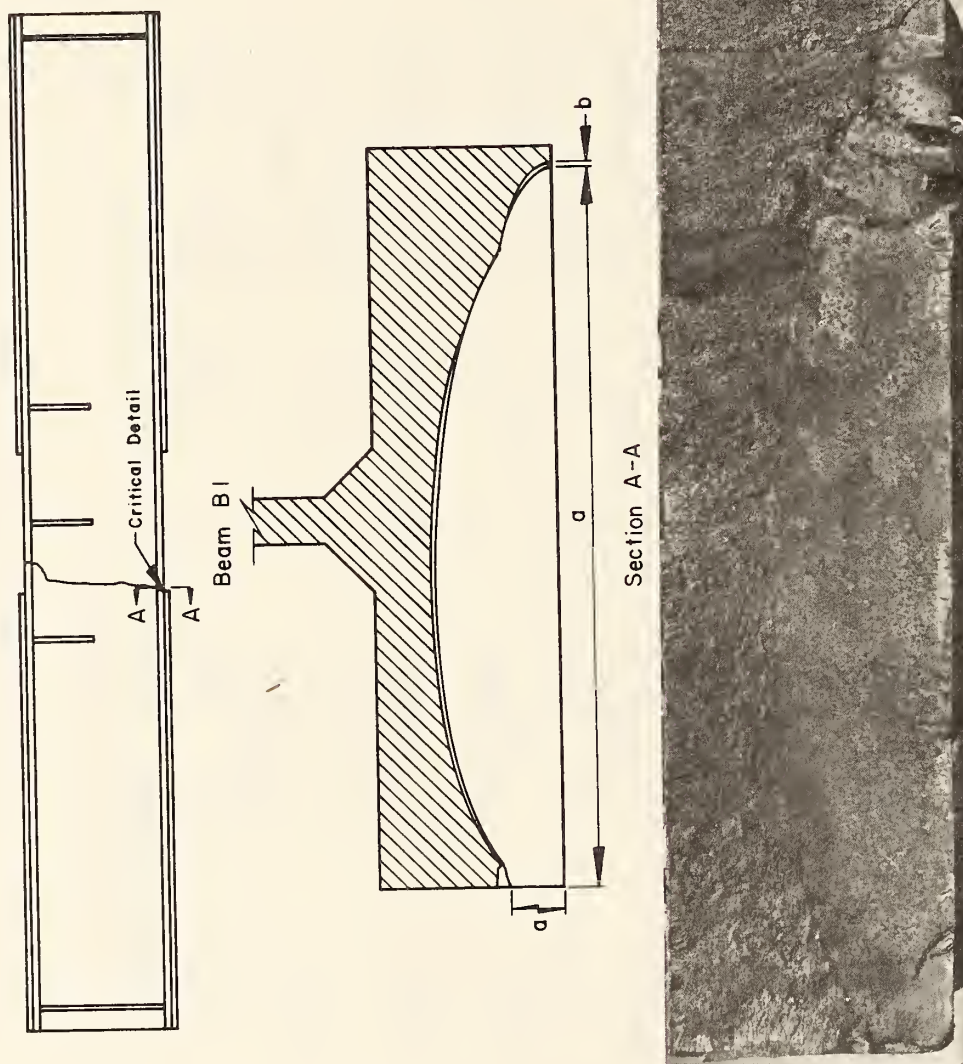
Fatigue and Fracture Surface, B1 (A514)
